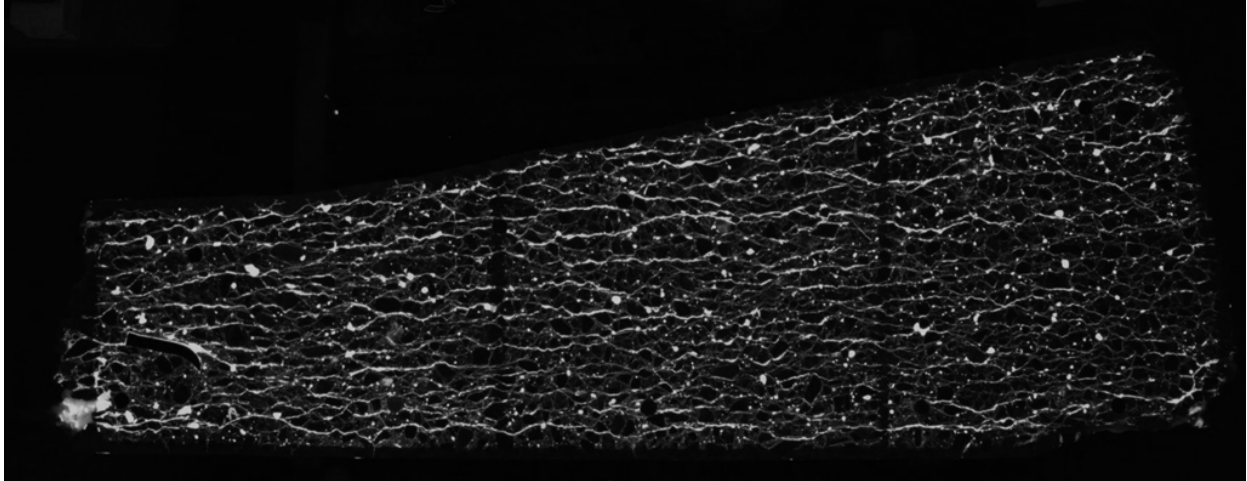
Fluorescent impregnated cantilever beam surface seen under ultra-violet light. The figure shows comprehensive ASR induced horizontal cracks (i.e parallel to the surface of the bridge deck). The dimensions of the beam are shown in the text.
